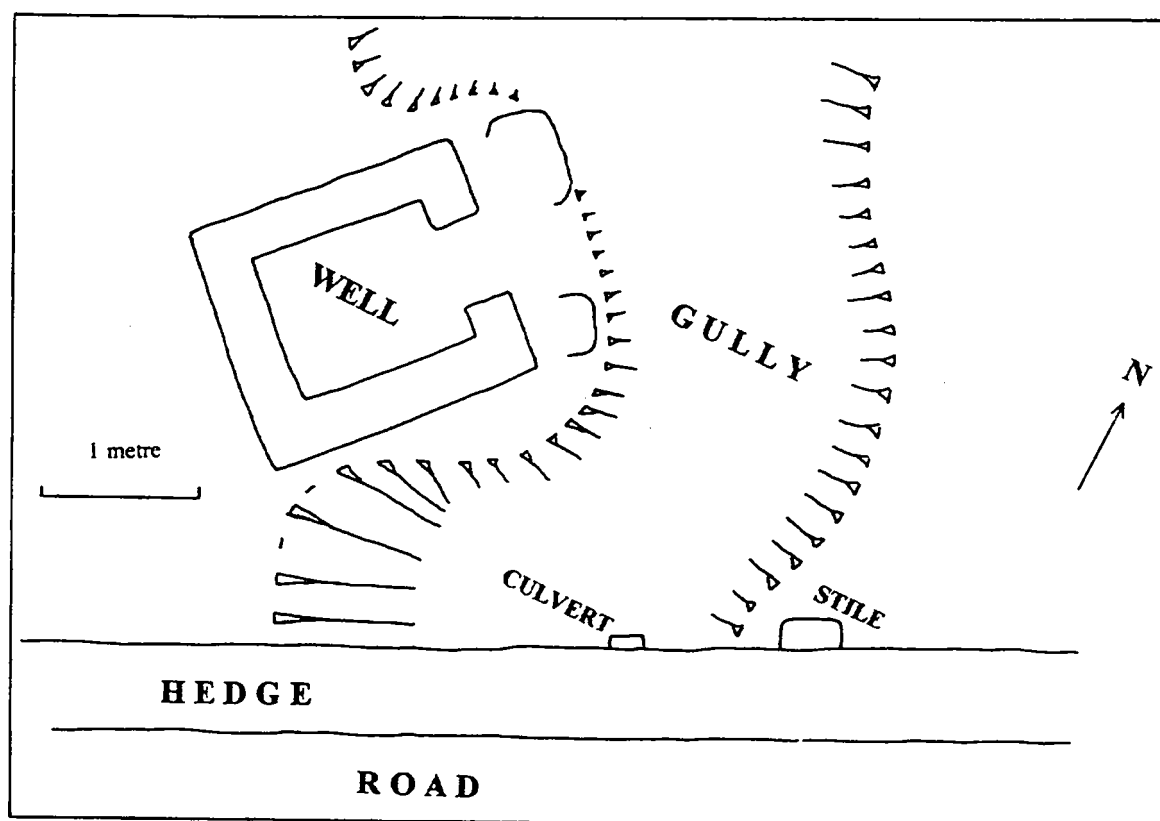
Sketch plan showing the extent of gulying in front of the well-house, before restoration of the ground.
